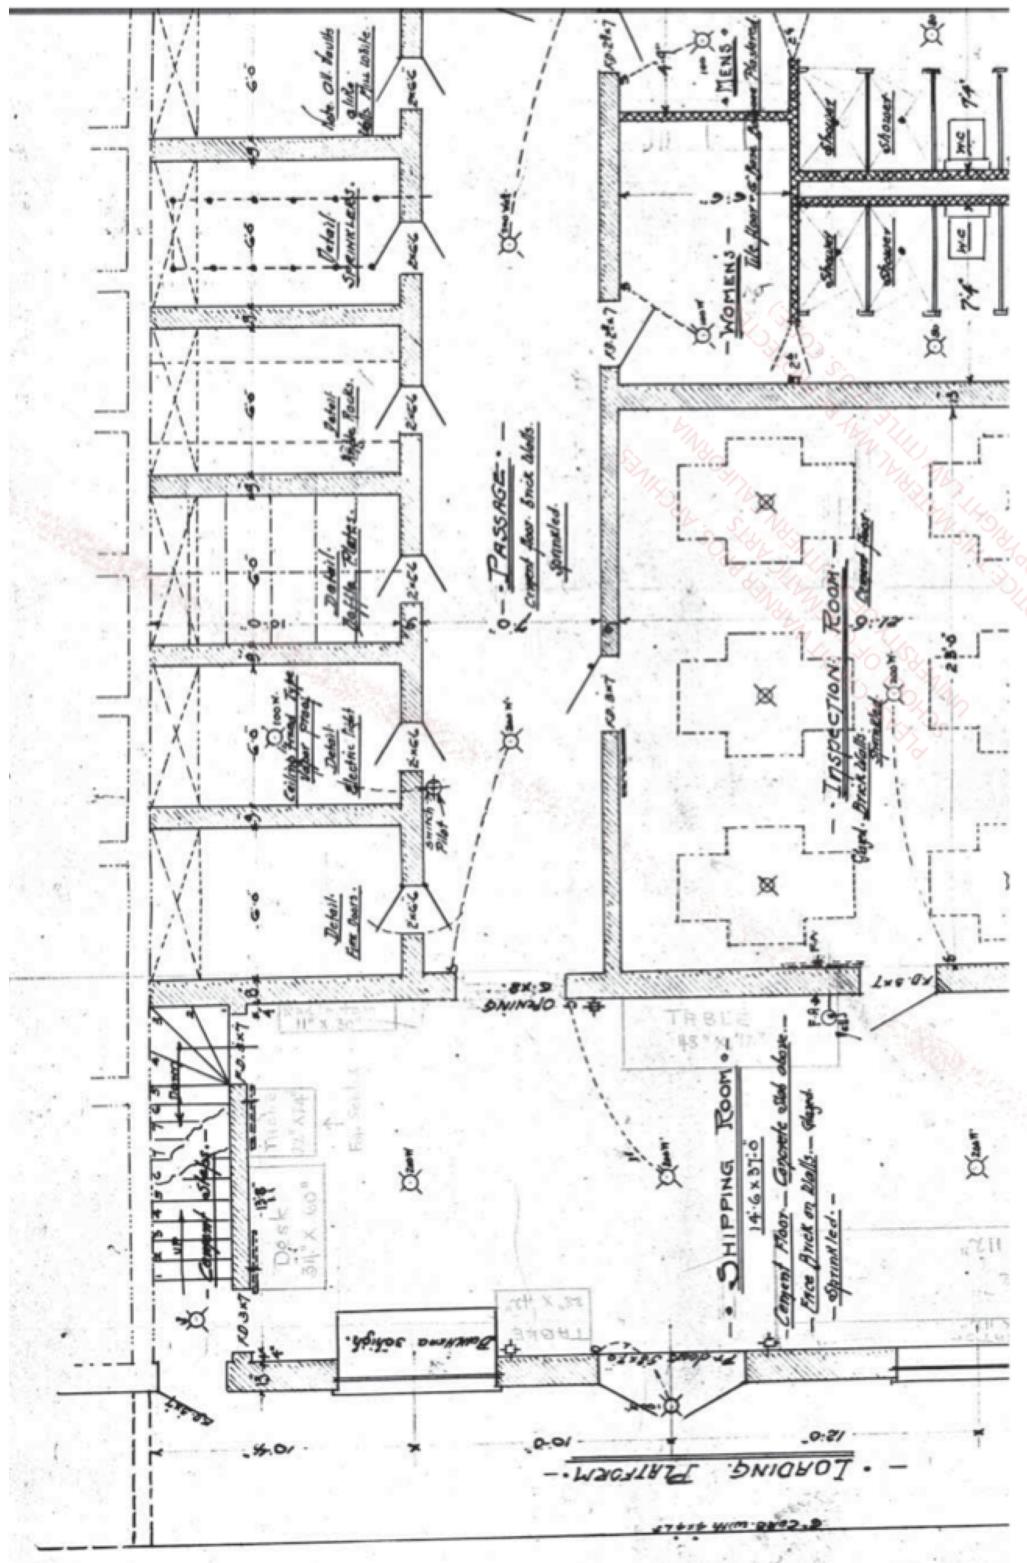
Warner Bros. Atlanta Exchange Floor Plan (Partial)
